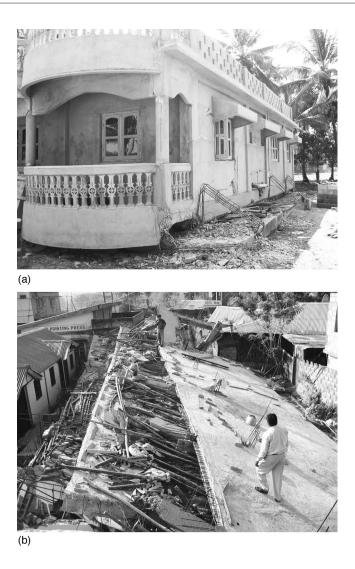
(a) Collapse of an open-story RC house at Rampur, near Mayabandar (photo: D. Rai). (b) Collapse of the RC bare frame of a three-story building under construction at Rangat, Middle Andaman Island (photo: G. Mondal).
